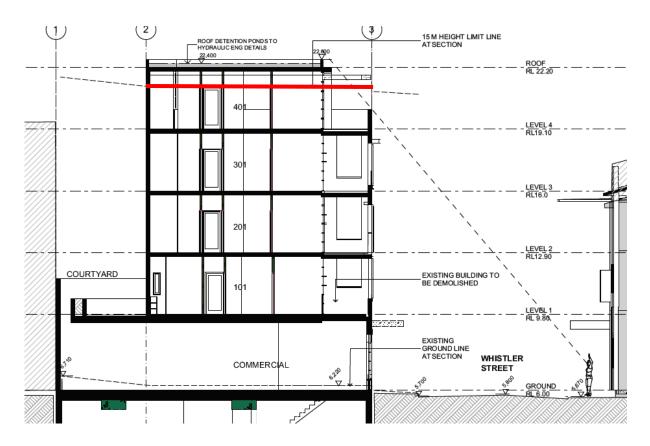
Extent of 15 metre height of building breach as shown on section AA
